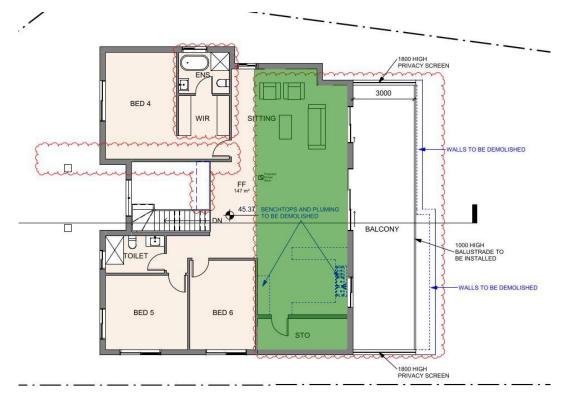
Additional gross floor area identified in green (Source: Council Planner)
